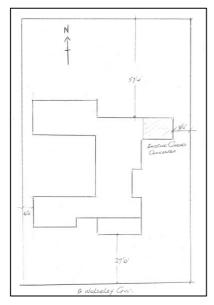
Site plan from 1972 Building Permit, which provided an outline of the house at the time. (permit sourced by property owner).
